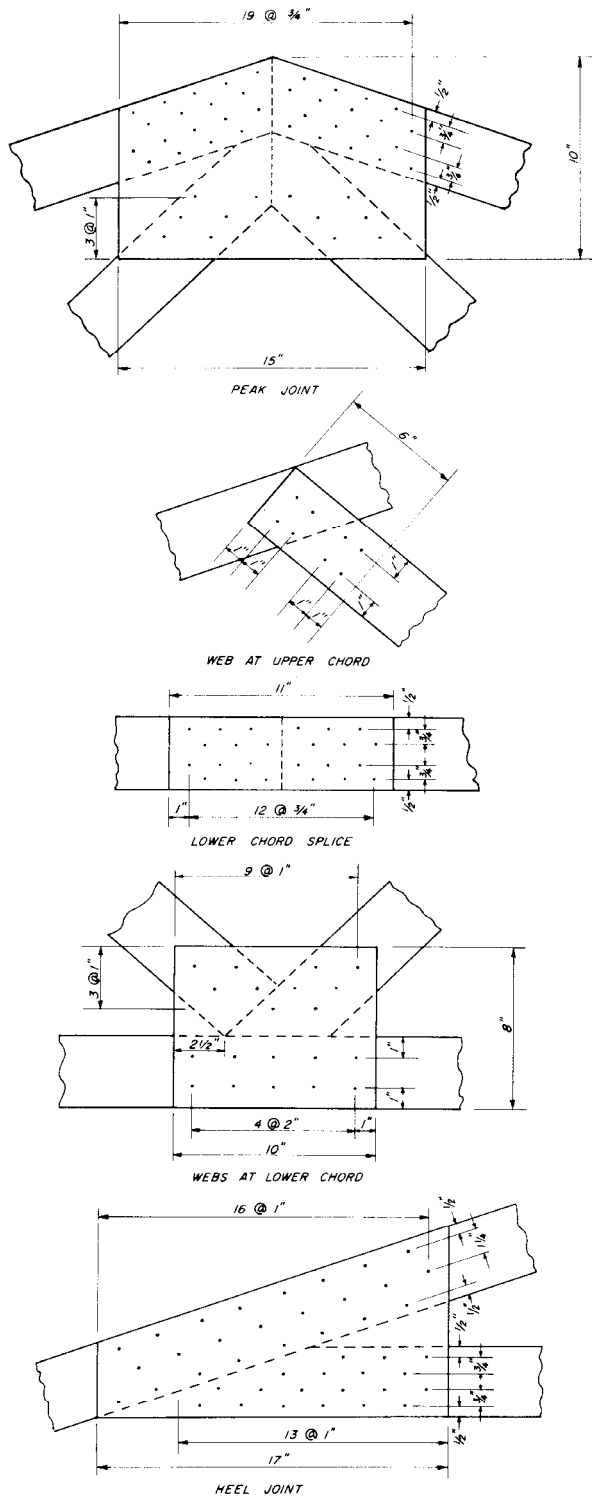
Joint details for nailed plywood trussed rafters. All gussets were 1/2-inch, exterior grade, Douglas-fir. The grain direction ran the long dimension of each gusset. All nails were sixpenny common. (M 134833)
